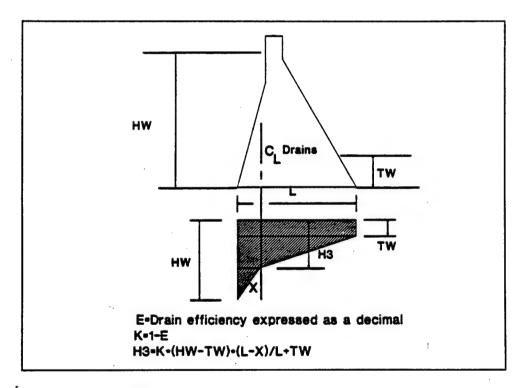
Uplift assumptions with foundation drainage provided (FERC (1991))
